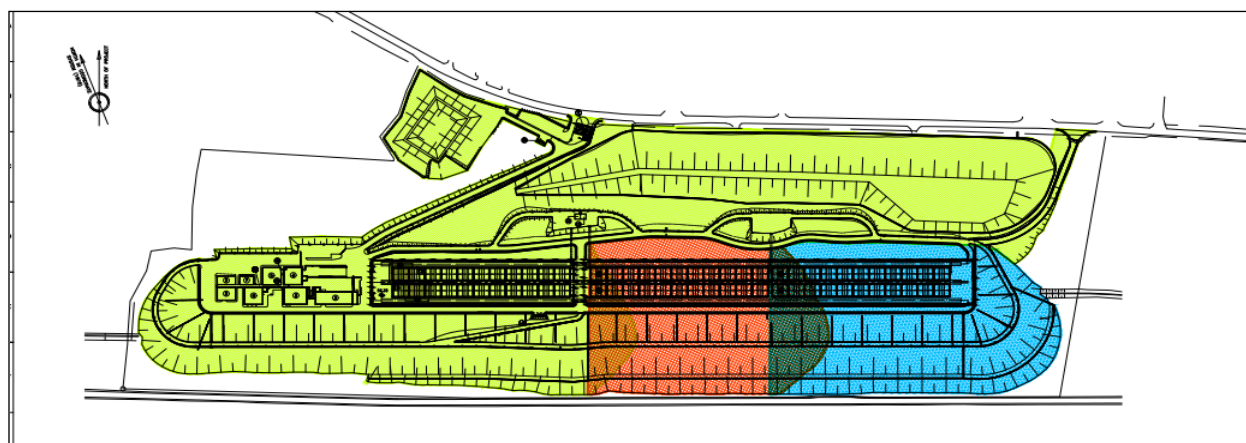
CONSTRUCTION OF INDIVIDUAL STAGES OF A TRENCH –TYPE REPOSITORY
